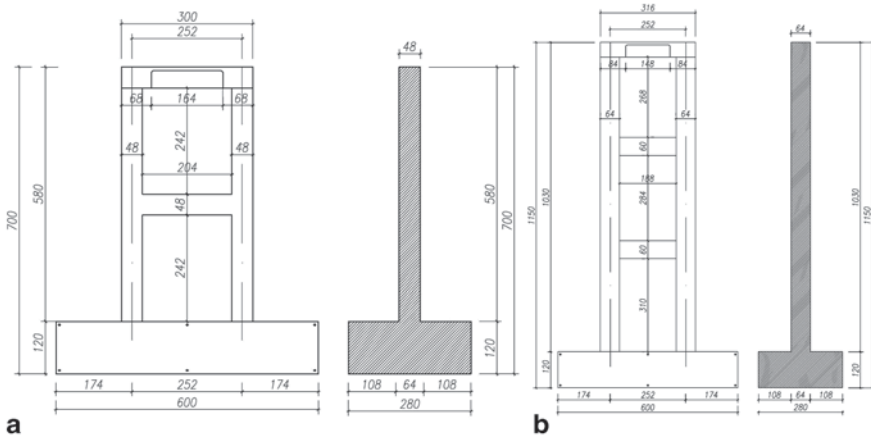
Layout of Piers 11 (left) and 9 (right)
